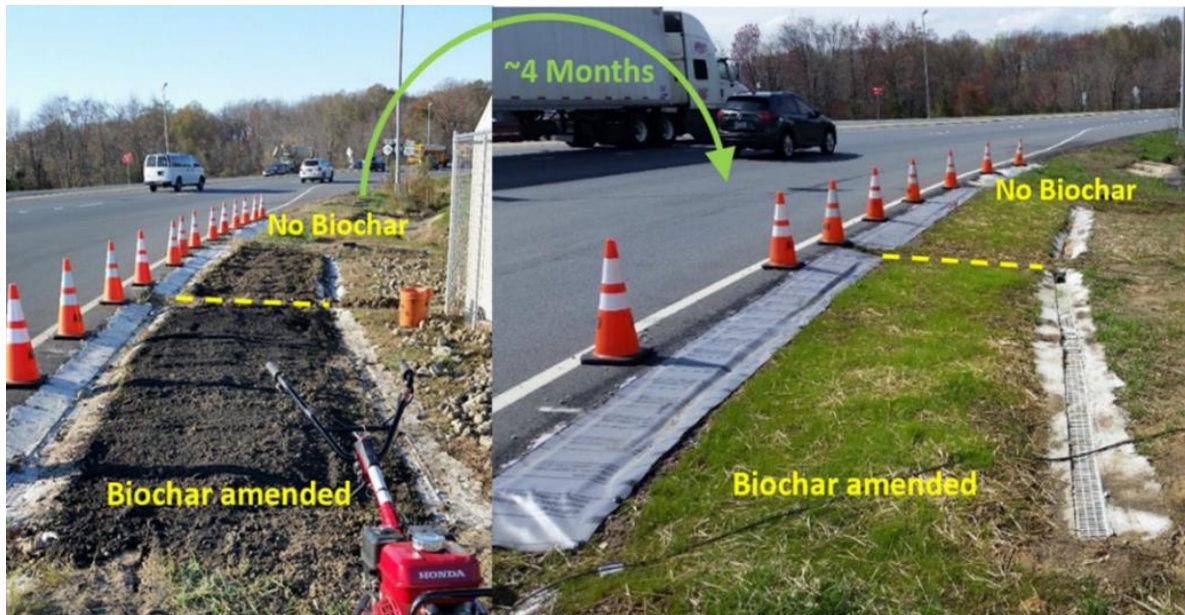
Installation of biochar and control section (Left) and trench drains in white concrete to document reductions in stormwater runoff for over 100 storm events (Right).
